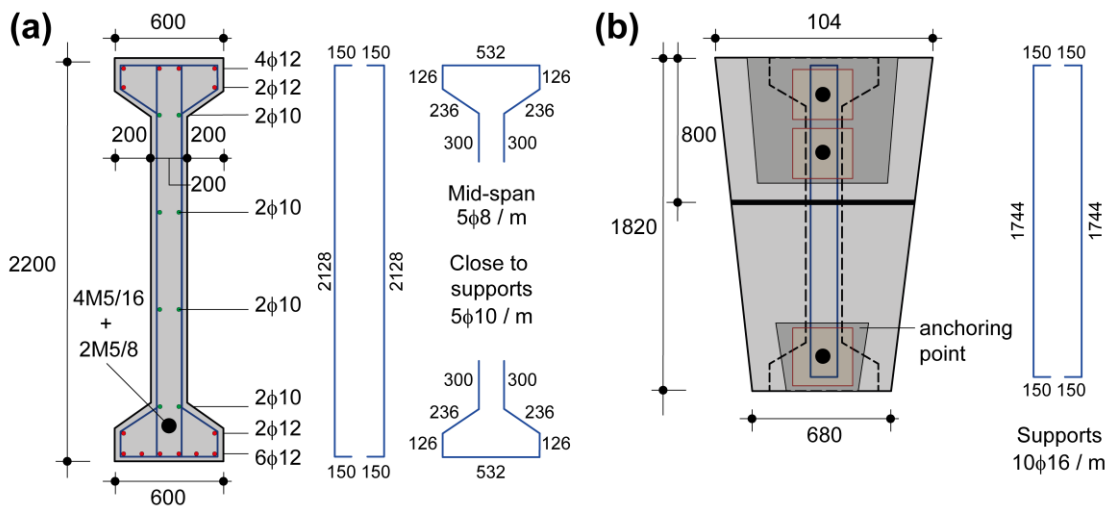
Prestressed beam cross-section with longitudinal and transversal reinforcement at (a) midspan and (b) close to supports. Dimensions in mm.
